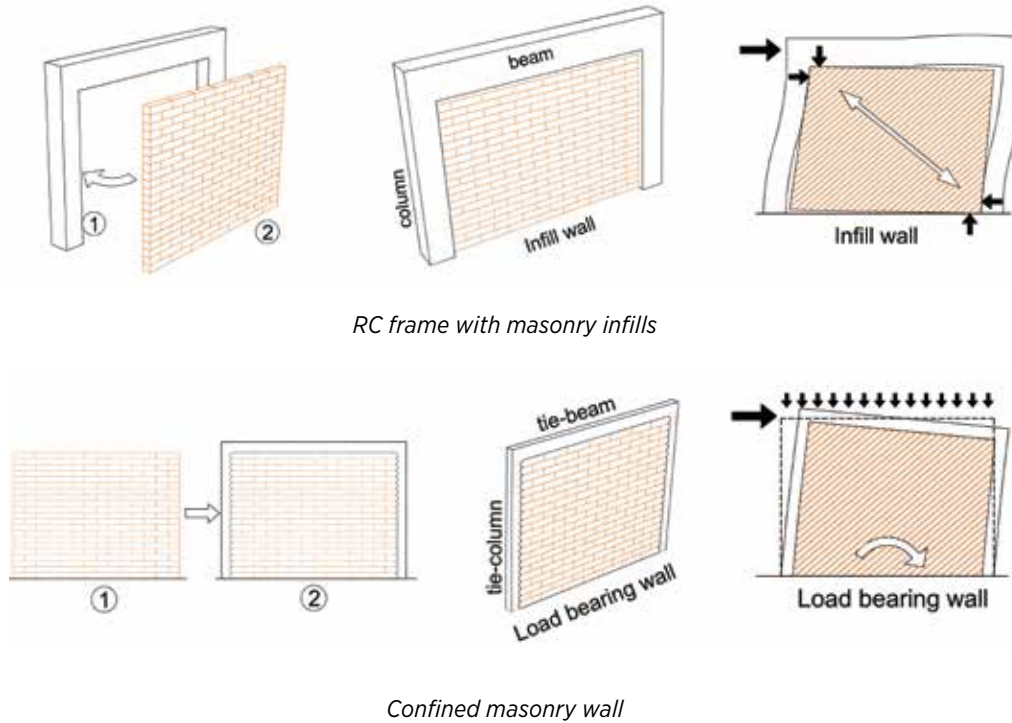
Comparison of a RC frame with masonry infills and a confined masonry wall (EERI, 2011).
